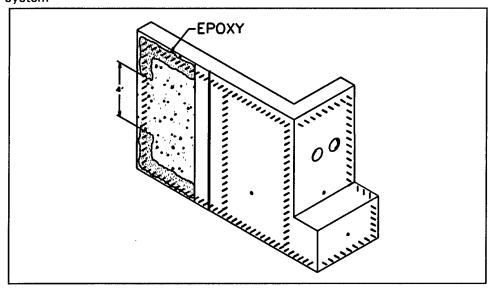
Four feet of surface preparation compound was removed from rough concrete prior to lowering the wall underwater
